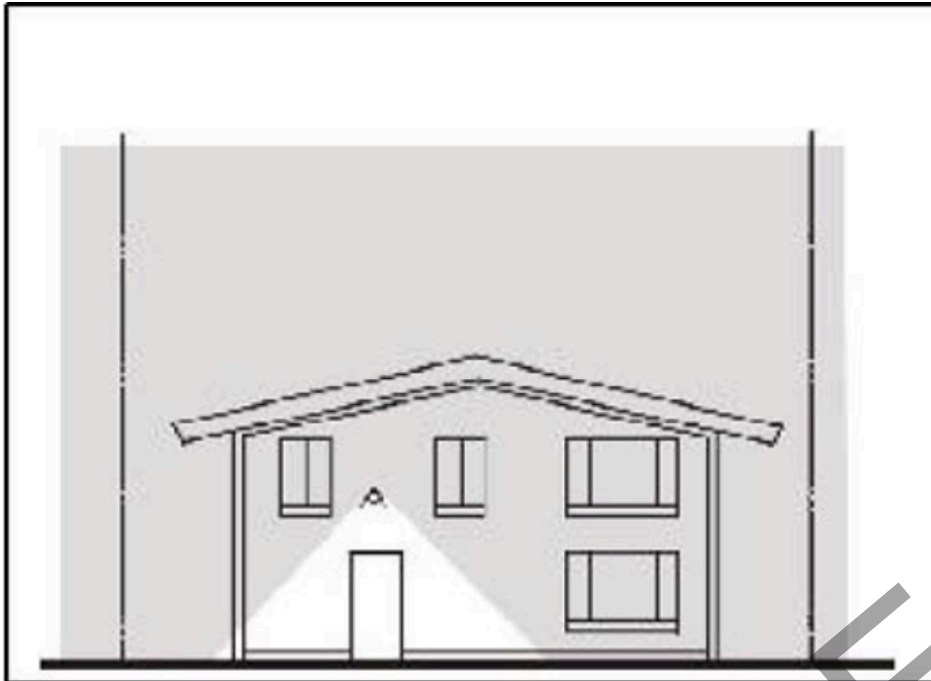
Light should be directed downward and light sources shielded from off-site view.
